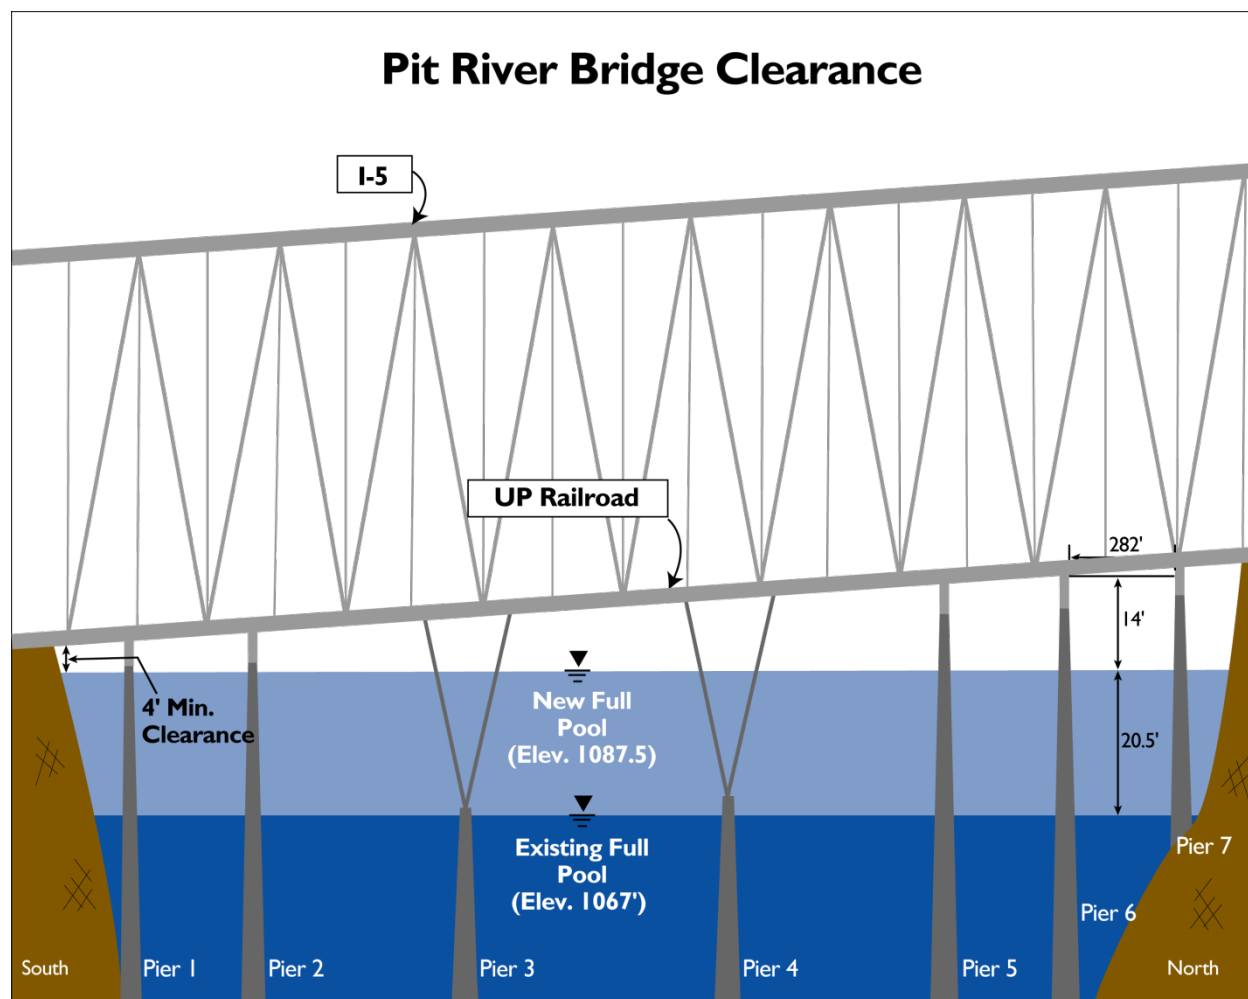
Minimum Clearance for Boat Traffic at Pit River Bridge, Full Pool with 18.5-foot Dam Raise
